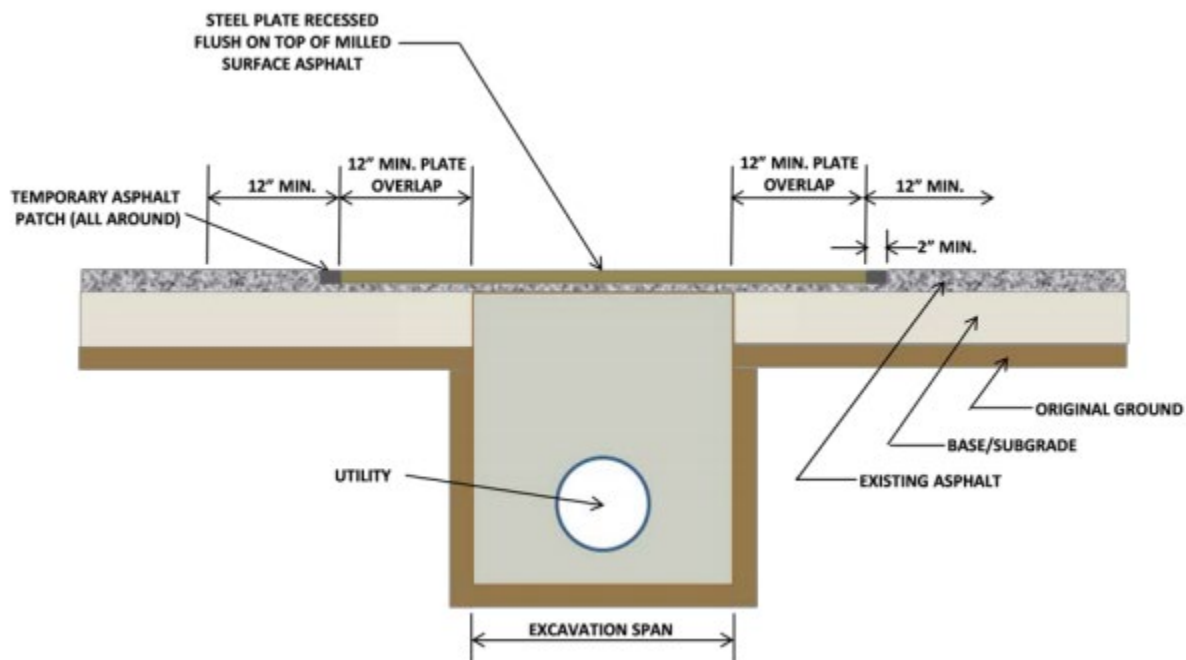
Temporary Plating Recessed into existing asphalt pavement.
